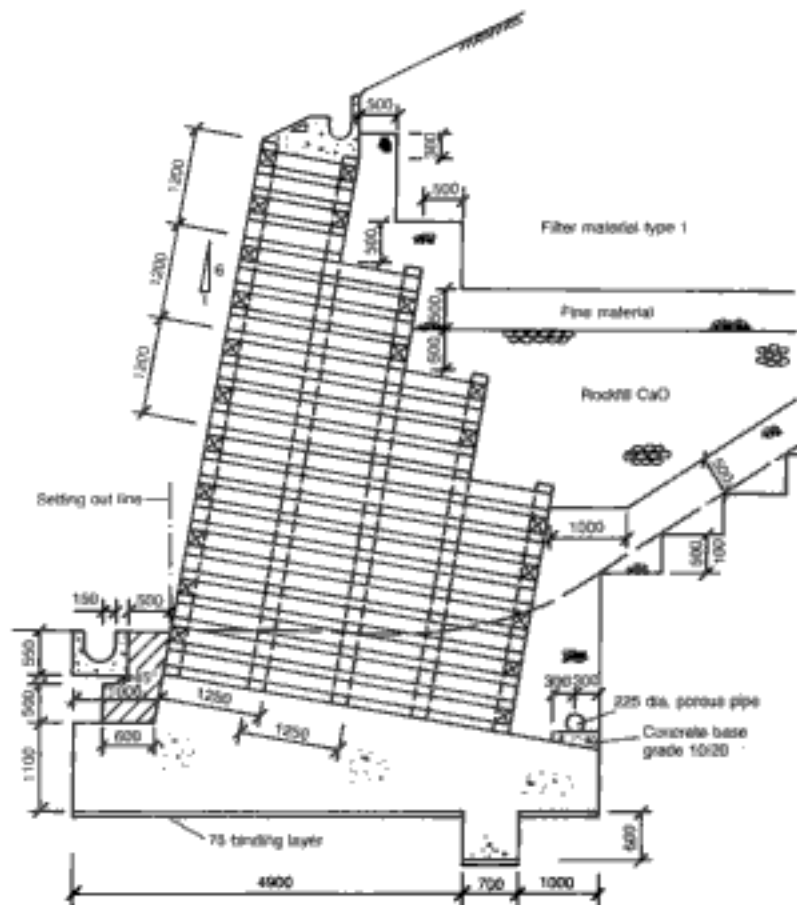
Typical cross-section through four-cell wide crib wall in Tsing Yi, Hong Kong (Daley and Thomson¹³)
